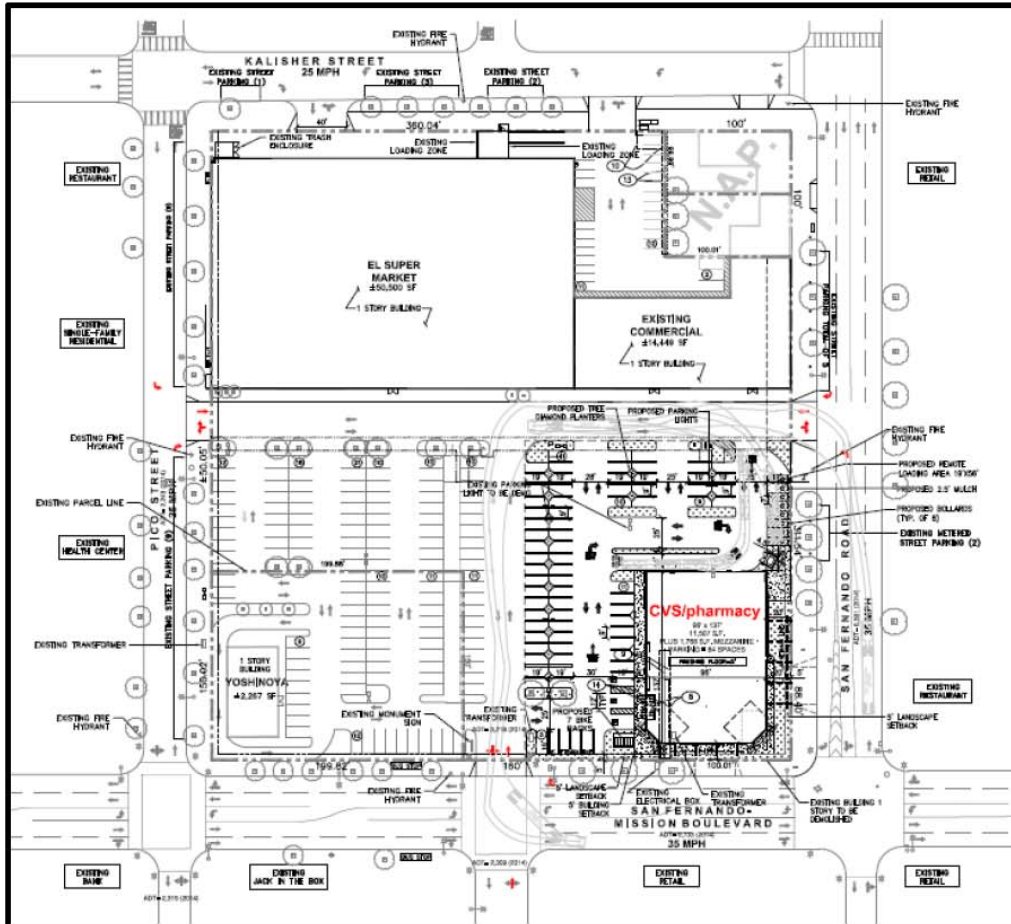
PROPOSED SITE PLAN OF CVS PHARMACY
